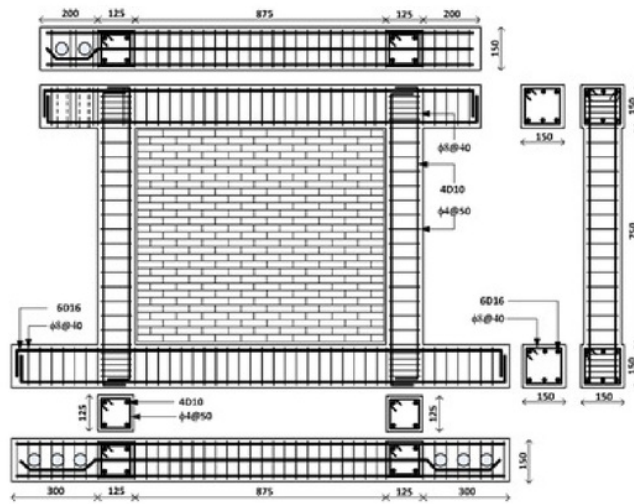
Geometry and reinforcement detail of the infilled R/C frame specimen
